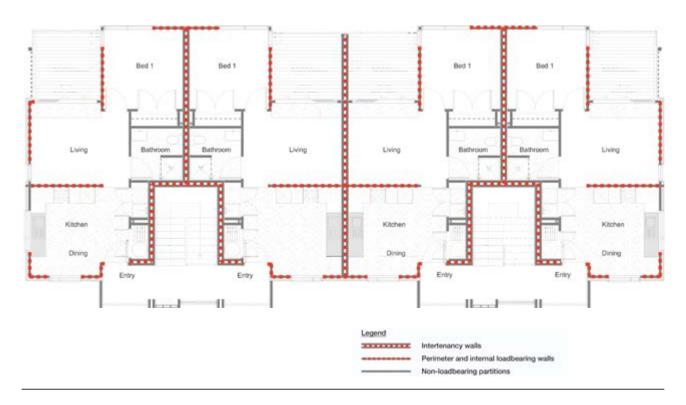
Apartment layout showing perimeter and internal loadbearing walls, and non-loadbearing partitions
